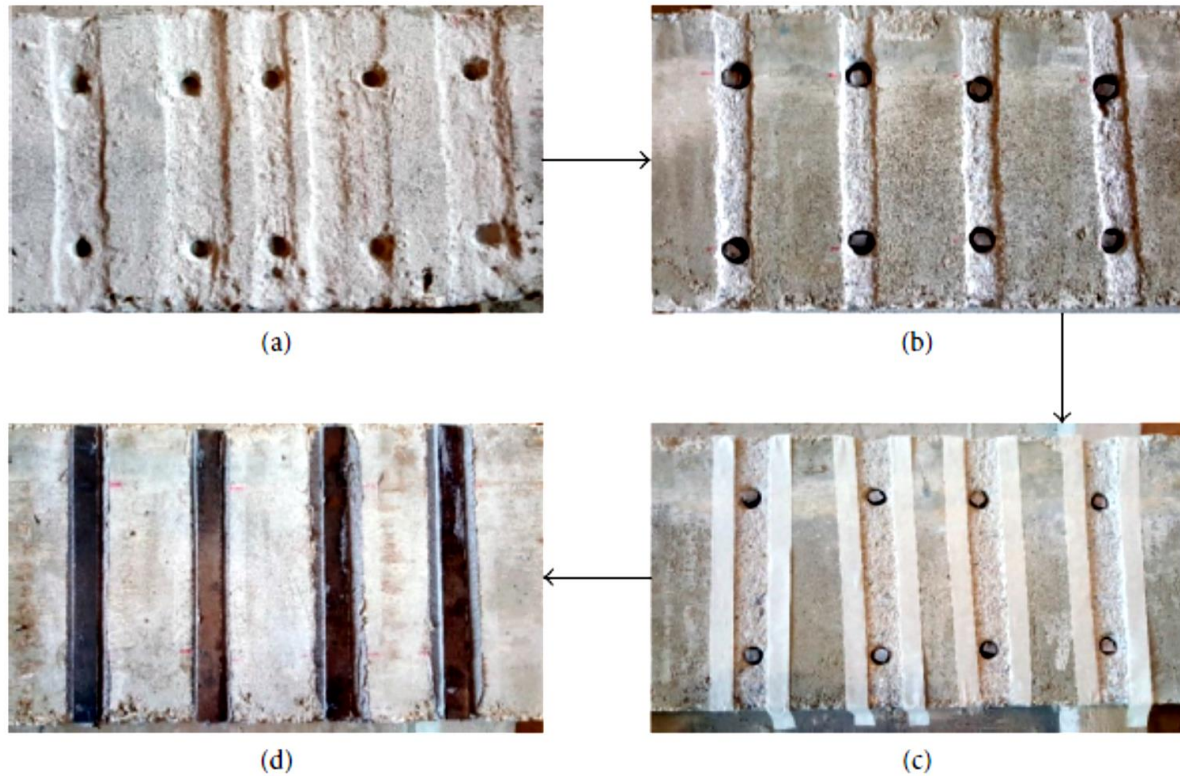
Shear strengthening of RC beam using steel plate and embedded connector: (a) surface preparation with hole of connector; (b) embedded connector; (c) prepared surface and connector for strengthening; (d) shear-strengthened beam.
